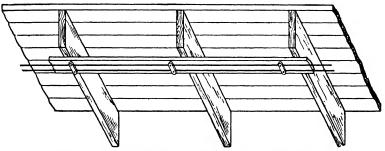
Running Board for Cleat Work on Widely Spaced Beams
